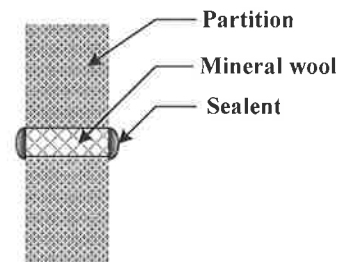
The principle of soundproofing of an opening or hole in a wall/floor.
